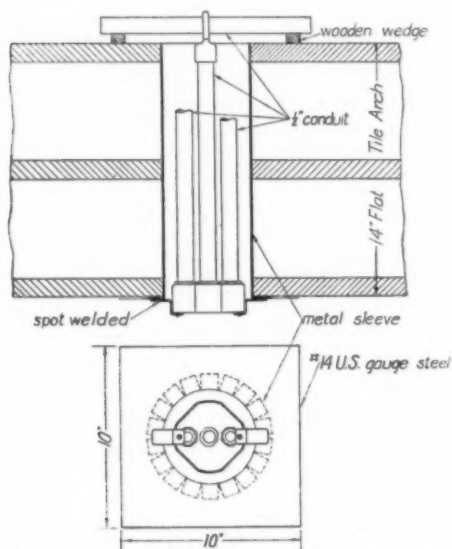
Sleeve installed in arch and jig for ceiling outlet box
